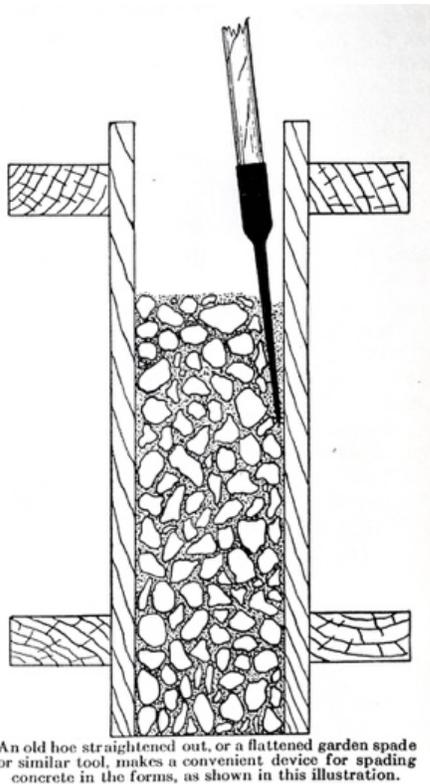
Photograph and caption from the 1916 handbook “Proportioning Concrete Mixtures and Mixing and Placing Concrete,” published by the Portland Cement Association, describing the spading of concrete. Note the detail hatch indicating the standard use of dimensional lumber for formwork. Image: public domain.
